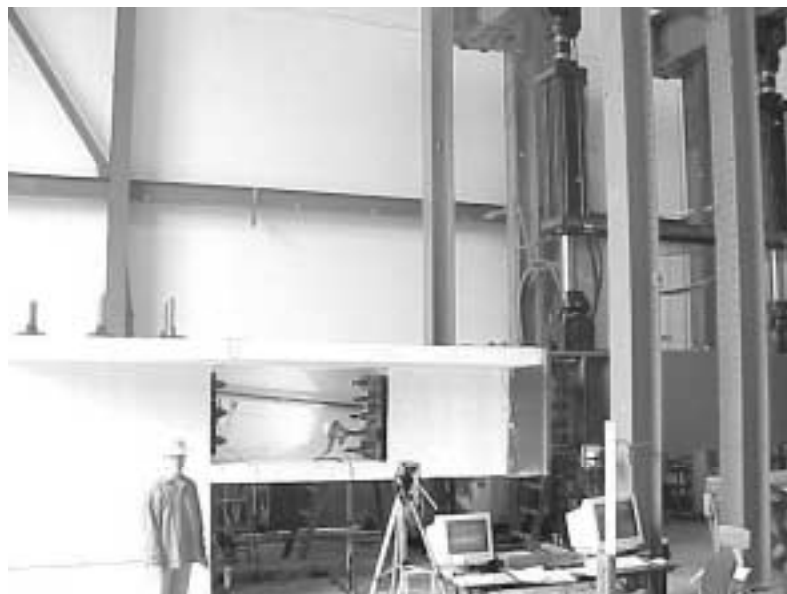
Test setup (Test Unit 50-INT/50-EXT)
